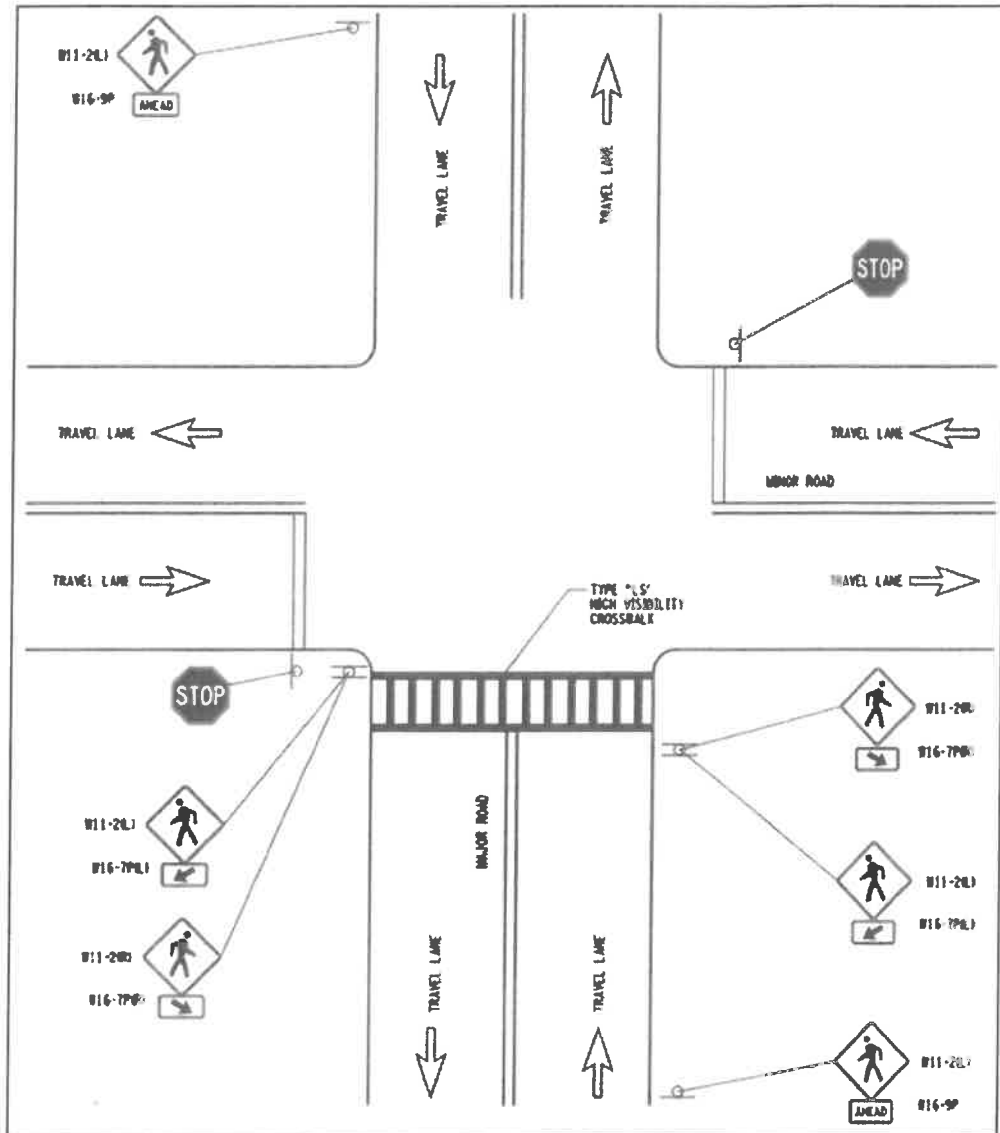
Sign plan for Uncontrolled Crosswalks at Intersections
